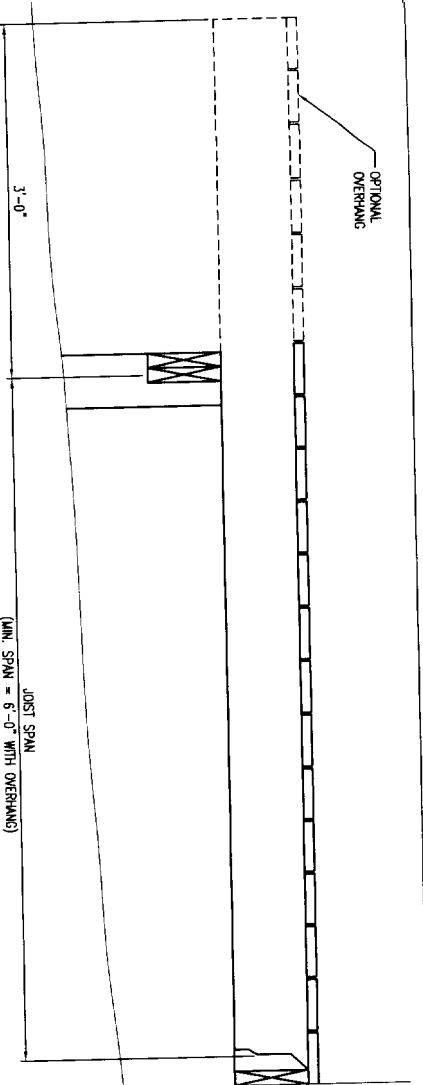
JOIST SPAN - DECK ATTACHED AT HOUSE
